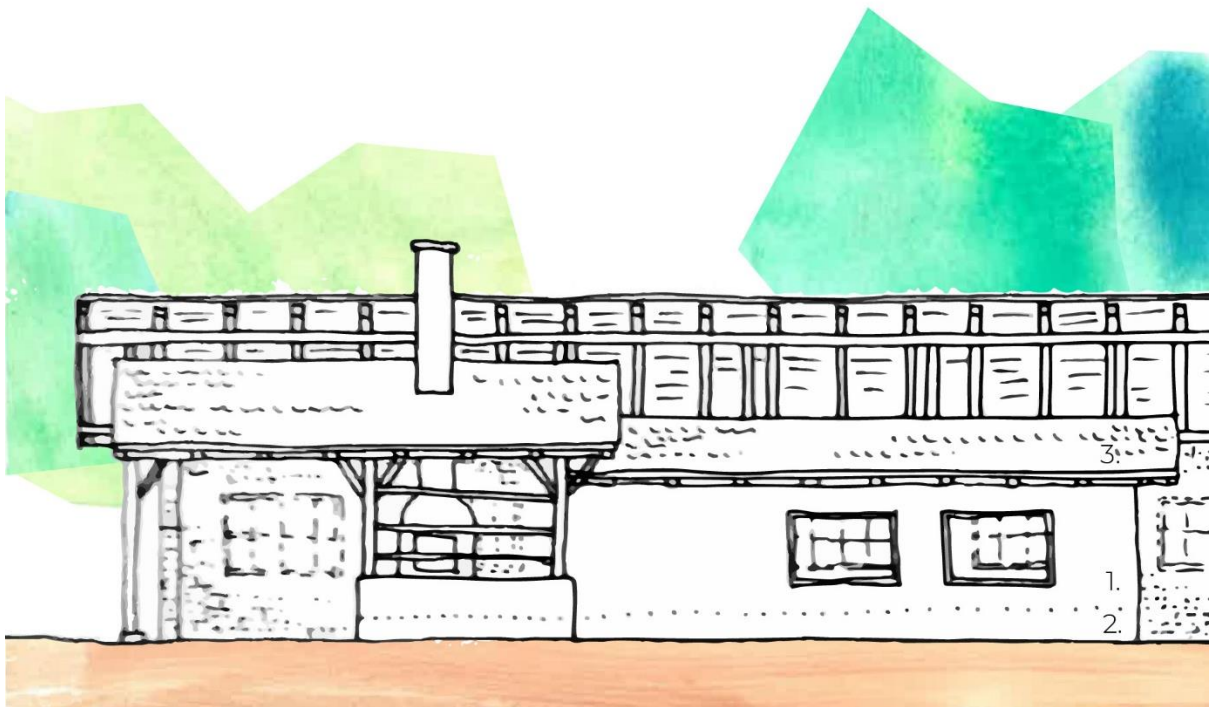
North-west façade of the visitor's facility, Part 1, scale 1:100
